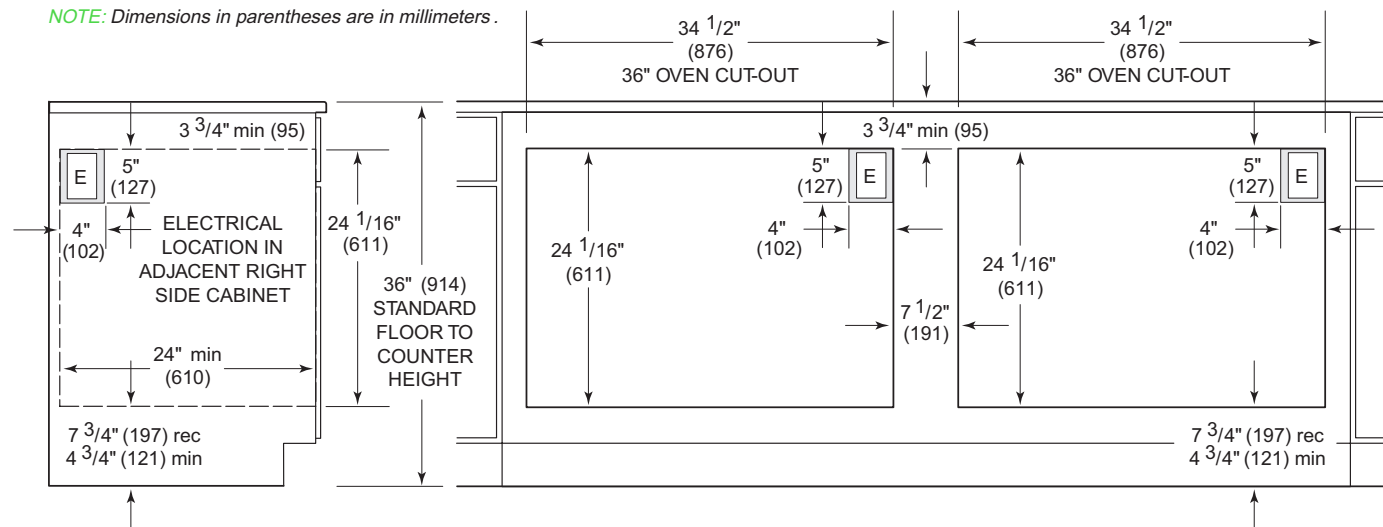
Undercounter Cutout Dimensions and Electrical Placement for SO36
